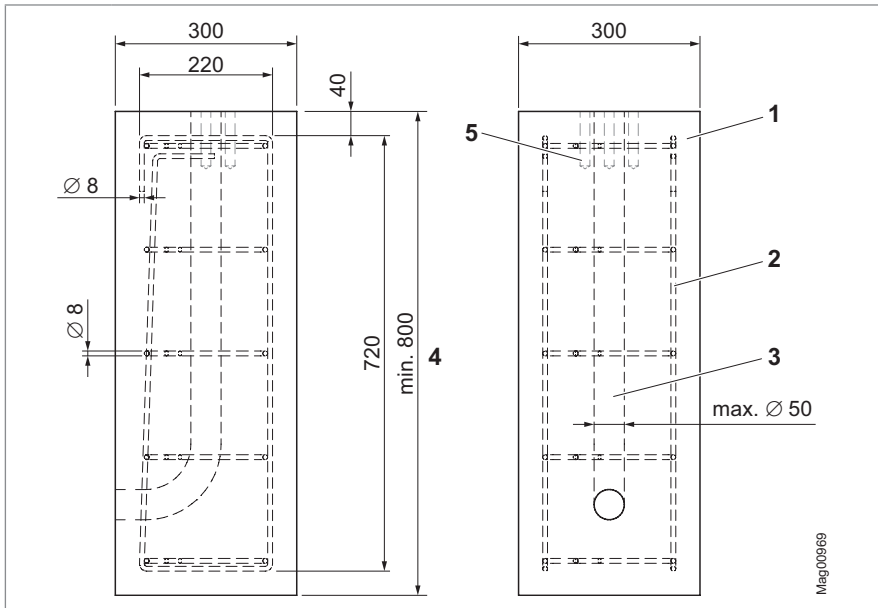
Foundation and empty conduit plan and reinforcement (dimensions in mm)
